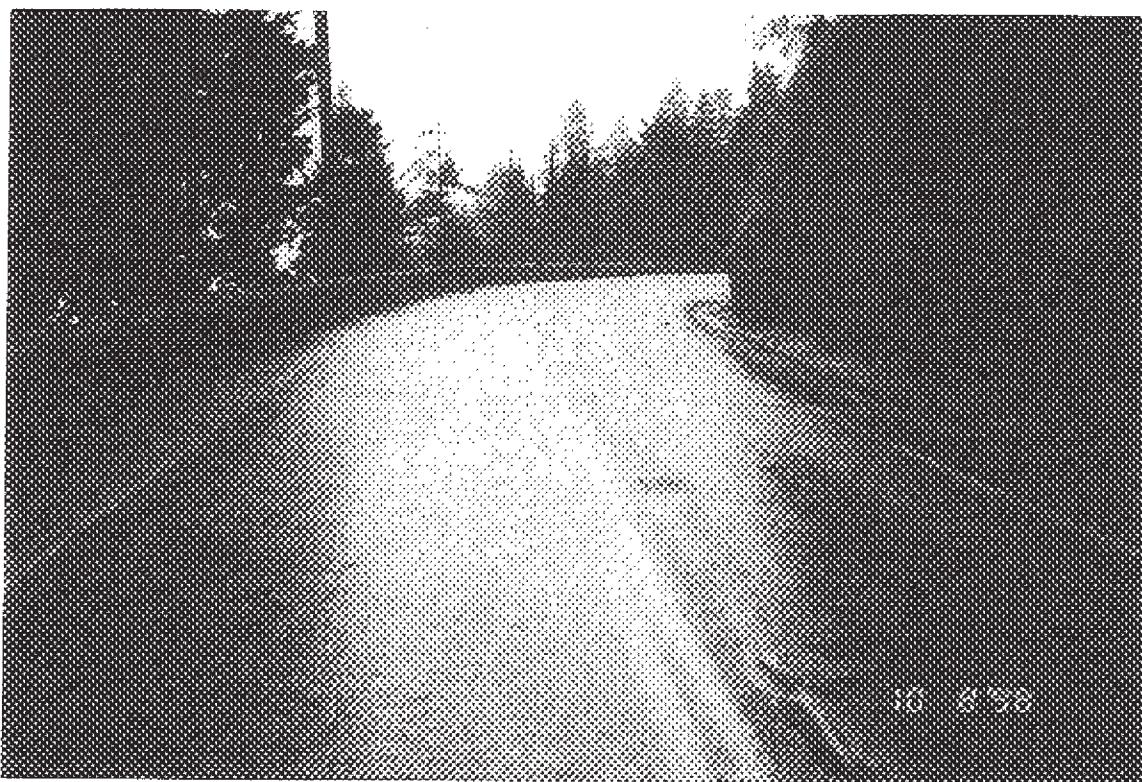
MP 13.70 - Guardwall, paved ditch
